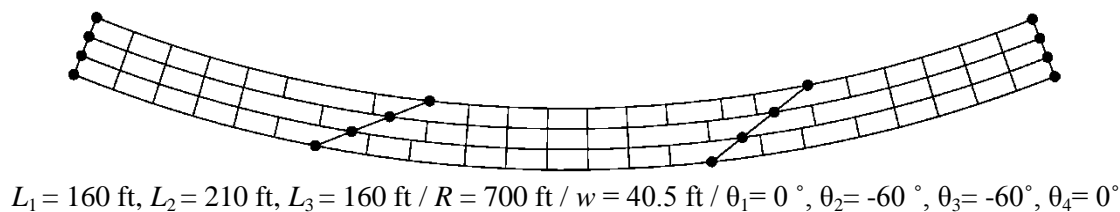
XICSS7 Bridge Layout – Case Study 1
